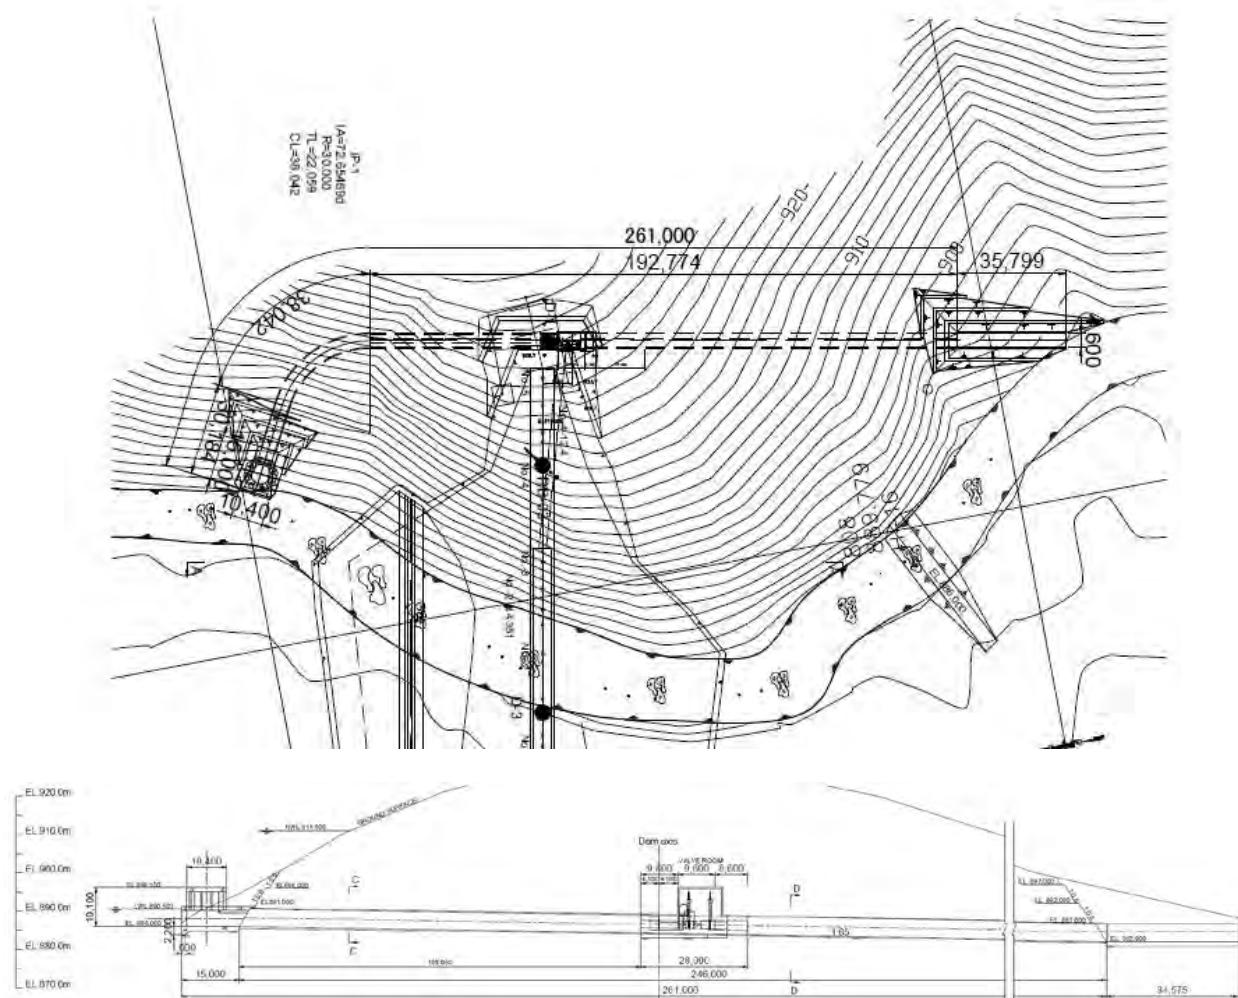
Layout Plan and Cross Section of Discharge Facility
